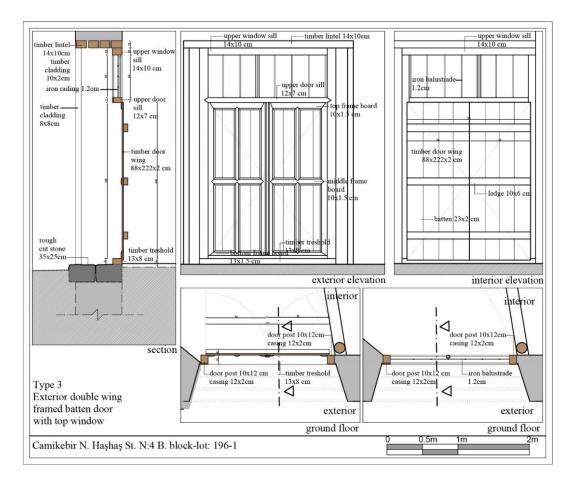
Drawing of exterior double wing framed batten door with top window located on stone masonry wall, Type 3 (Camikebir N. b. block-lot: 196-1)
